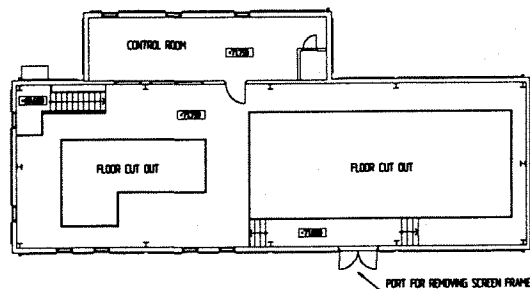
LAYOUT OF LABORATORY HALL WITH CONTROL ROOM AND FLOOR CUT OUTS FOR TUNNEL.
